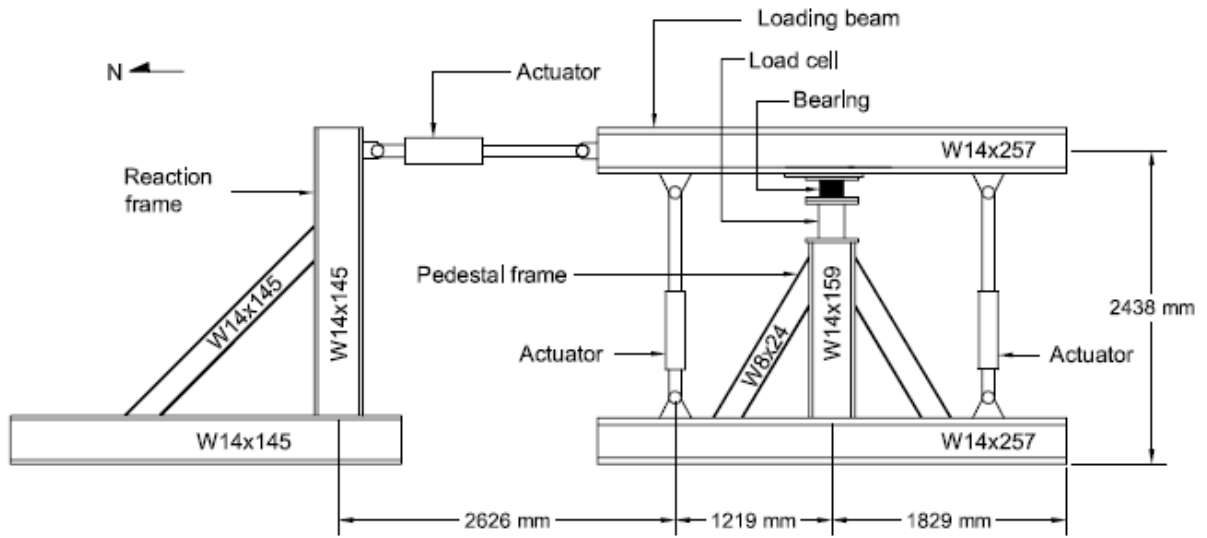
Schematic of Single Bearing Testing Machine (Warn, 2006)
